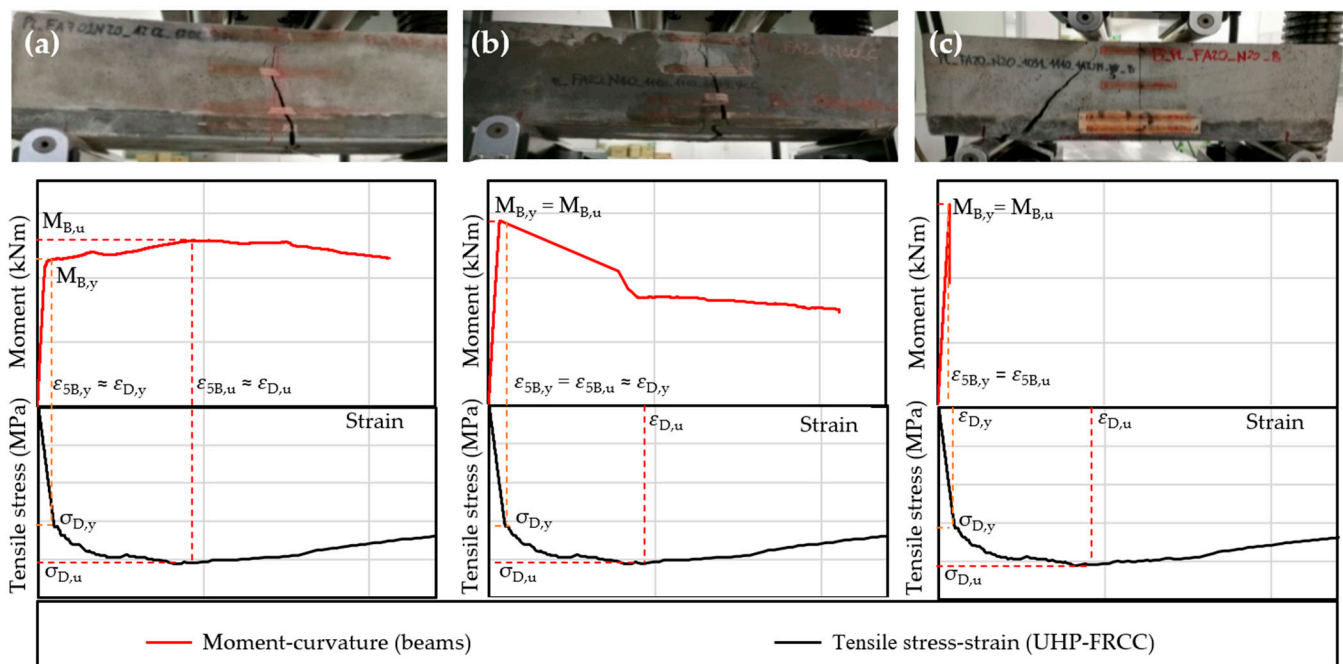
Failures of the beams in the test campaign 2: (a) failure in tension; (b) crushing in the compression zone; (c) shear failure.
